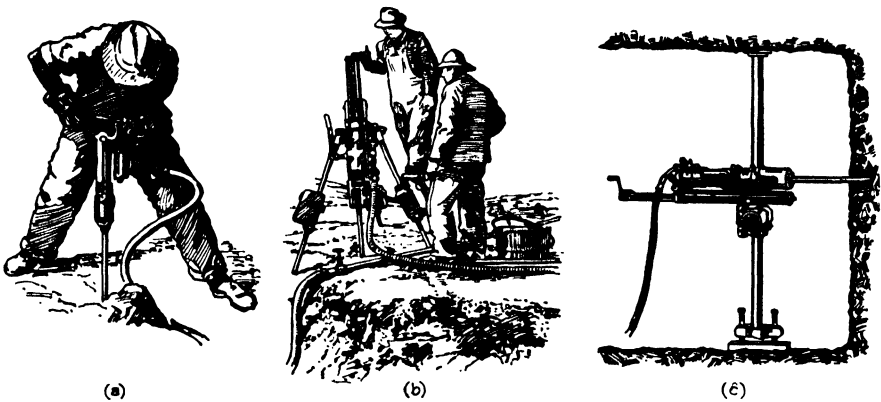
Rock Drilling Rigs. (a) hand; (b) tripod; (c) post and clamp. (Courtesy E. I. du Pont de Nemours & Co., Inc.)
